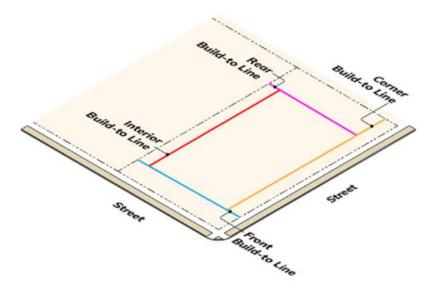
Graphic depicting the Front Build-To Line (BTL), Interior BTL, Corner Side BTL, and Rear Build-To Line on a lot.
